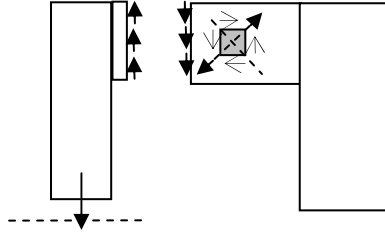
and 7.23. Facade walls. Opposing and concurring actions of floor loads, wall weights, and vault thrusts
